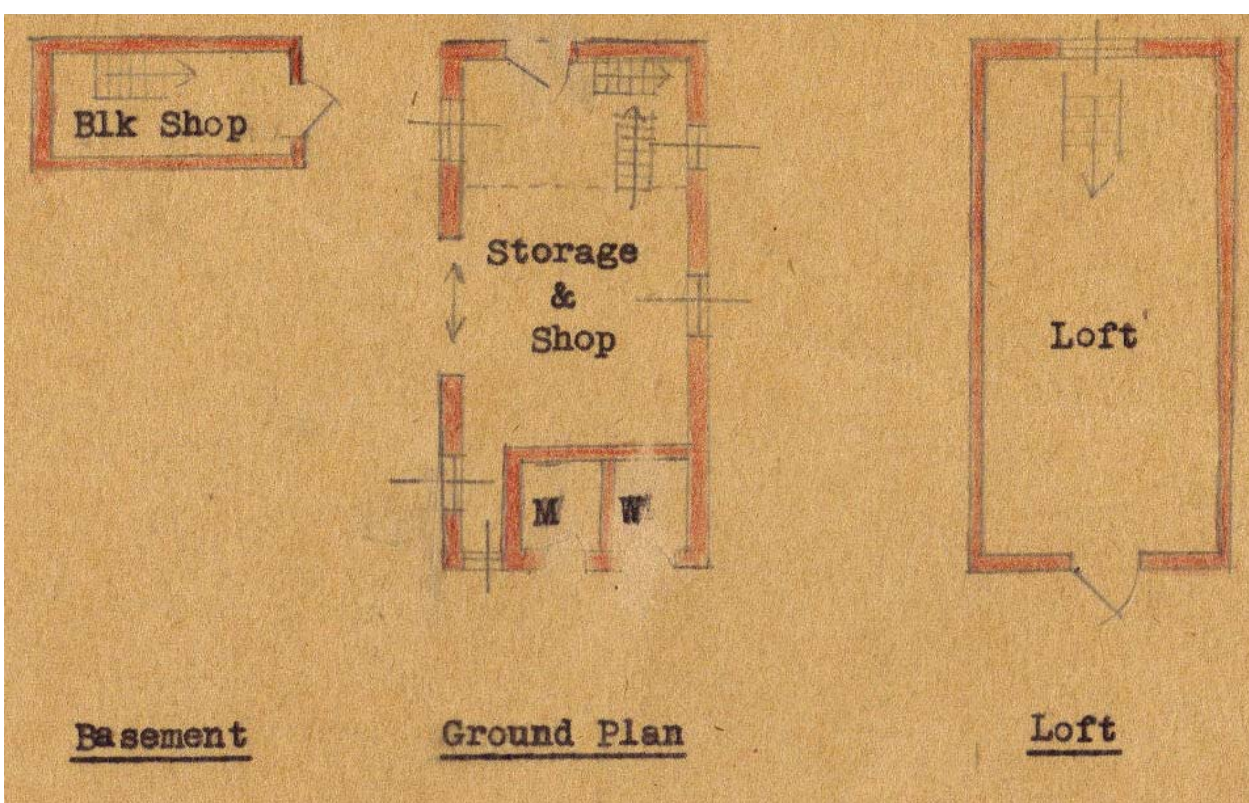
1949 Data Sheet, zoomed in, showing floor plans with stairs. Loft door and window are reversed.
